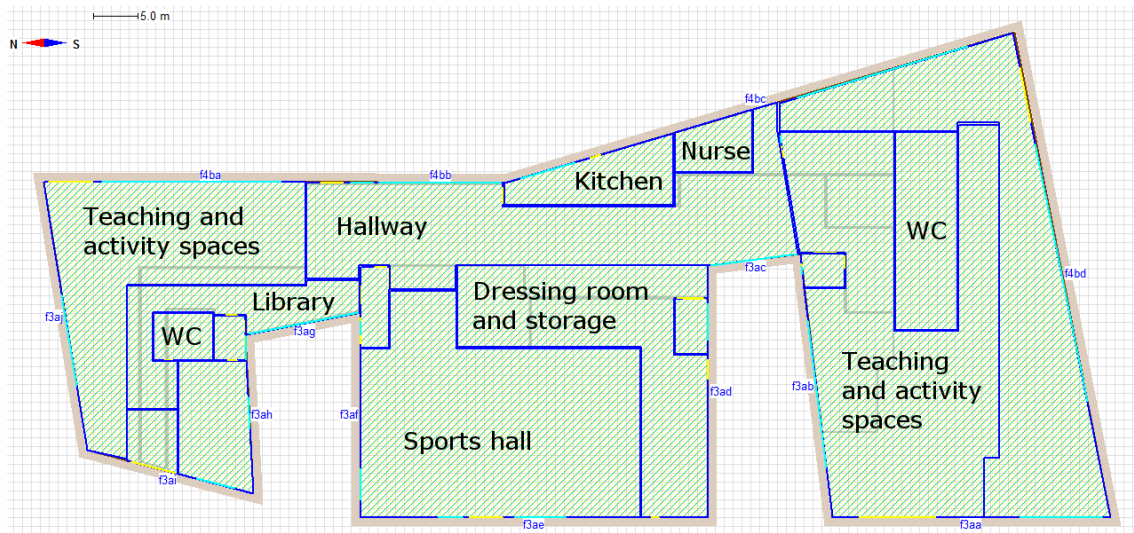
Floor plan of Vehmainen modified IDA ICE building model, with simplified zone division, ground floor. The school also has a 2nd floor.
